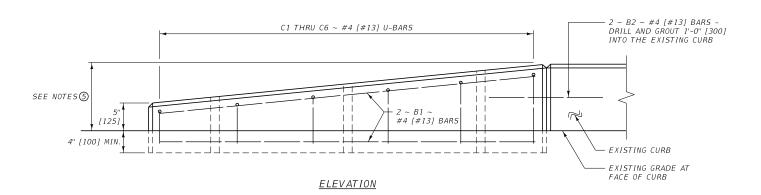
DETAILED DRAWING REFERENCE DWG. NO. STANDARD SPEC. SECTION 606 606-26
